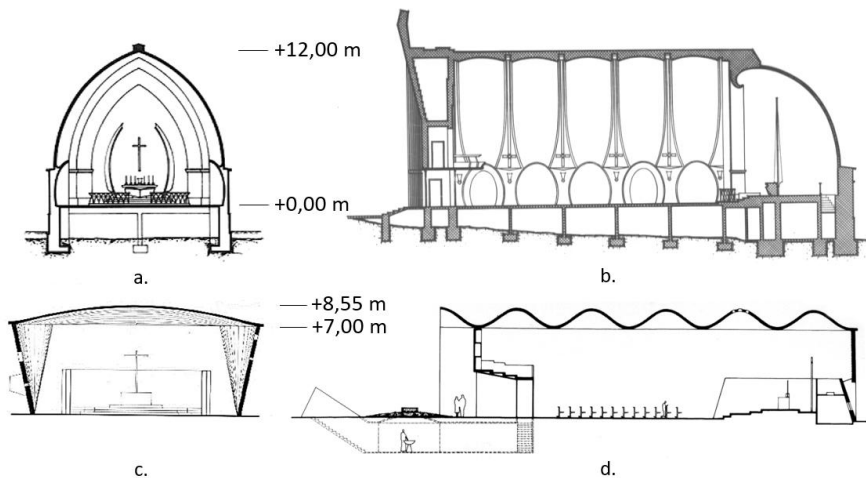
Pont de Suert Church: a. Cross section; b. Longitudinal section. Atlántida Church: c. Cross sección; d. Longitudinal sección. (Source: a y b: *Instituto de Ciencias de la Construcción Eduardo Torroja*; c y d: Jiménez, 1996, p. 152)
